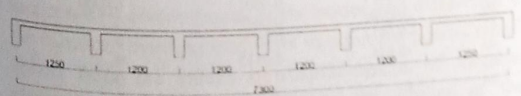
LONGITUDINAL SECTION OF THE WAFFLE BRIDGE DECK.
